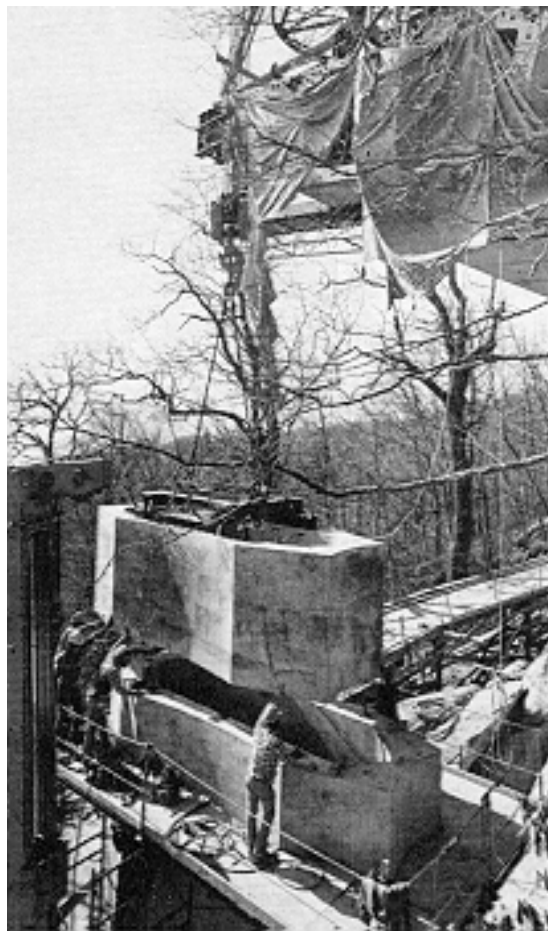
Precast hollow concrete pier segments lowered into position from the deck above at the Linn Cove Viaduct in North Carolina [10]
